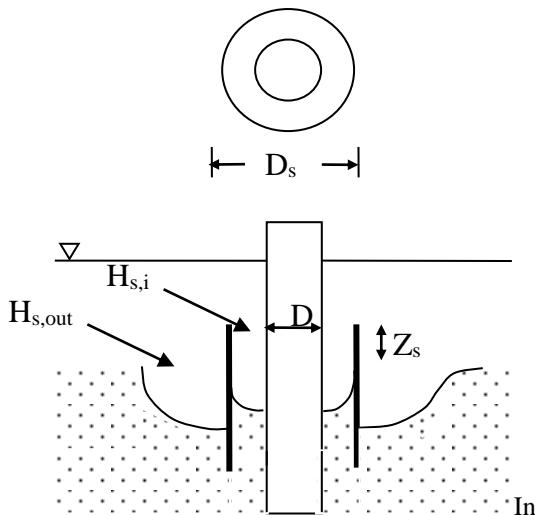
Sleeve around bridge pier shows scouring inside and outside sleeve
